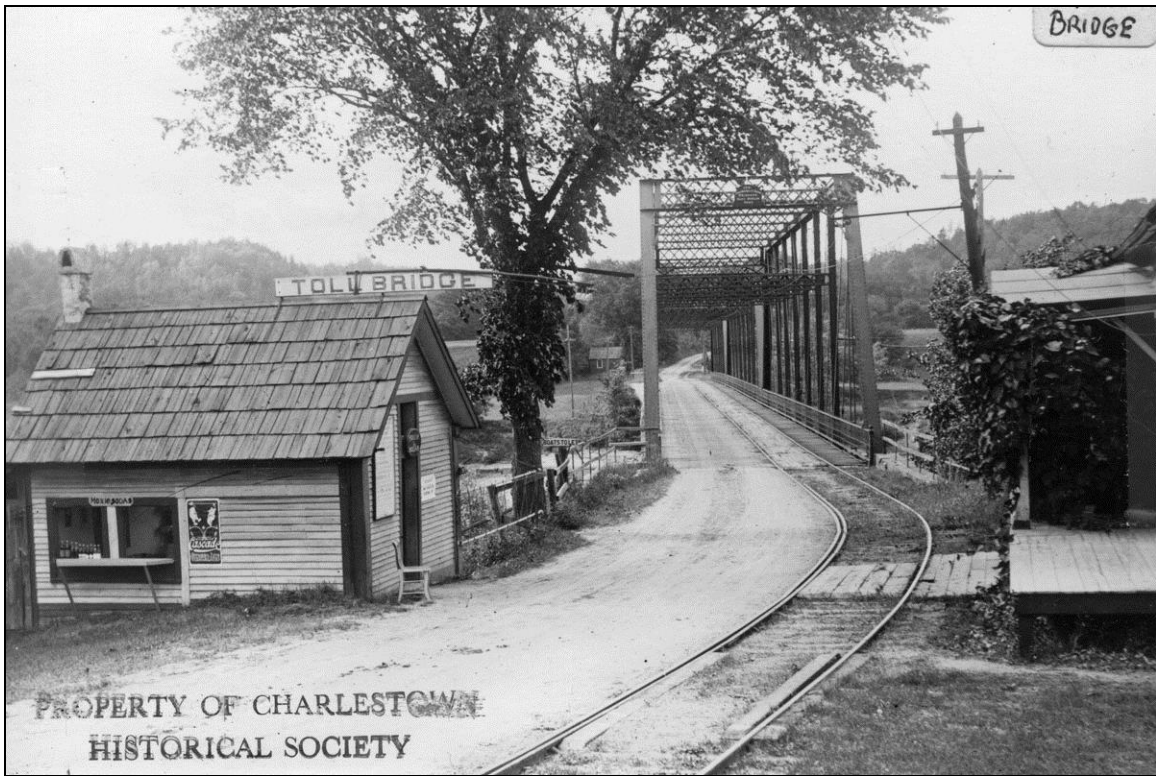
Cheshire Toll Bridge, 1896 truss, New Hampshire end shown in undated photo slightly later than photo in Figure 5 (Charlestown Historical Society).
